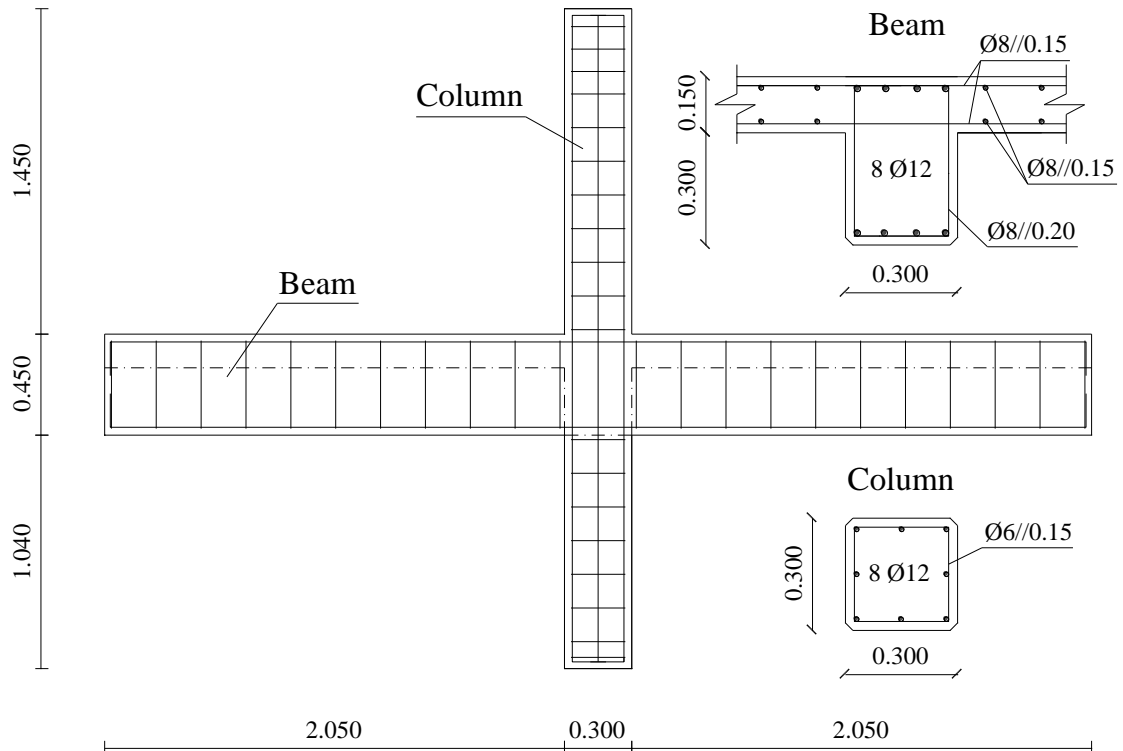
Full-scale beam-column joint specimen C2 reinforcement detailing (in m).
